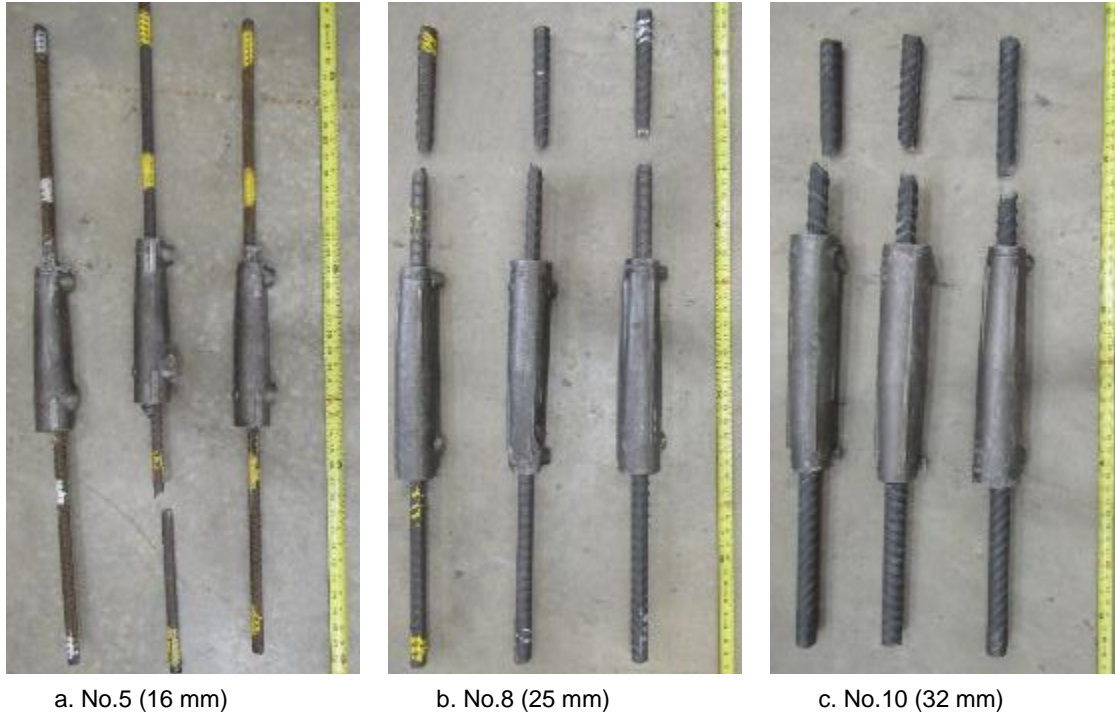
Failure of NMB Grouted Sleeve couplers under cyclic loading
